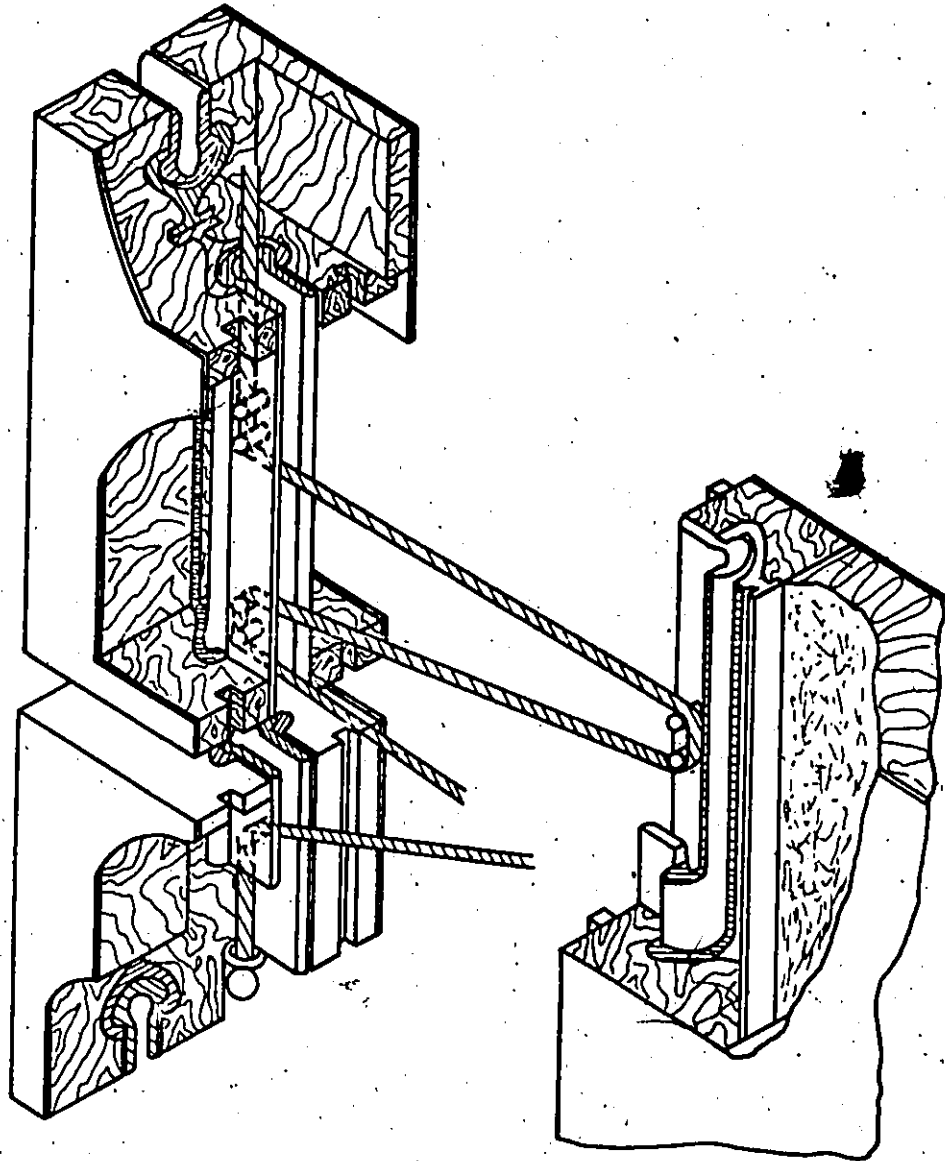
TWO PANELS BEING ASSEMBLED
